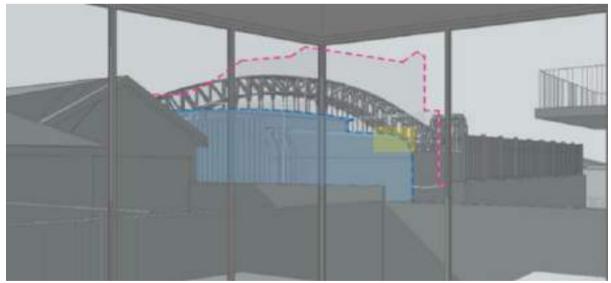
Proposed view from First Floor Kitchen/Dining Room (Source: Applicant's SEE)
